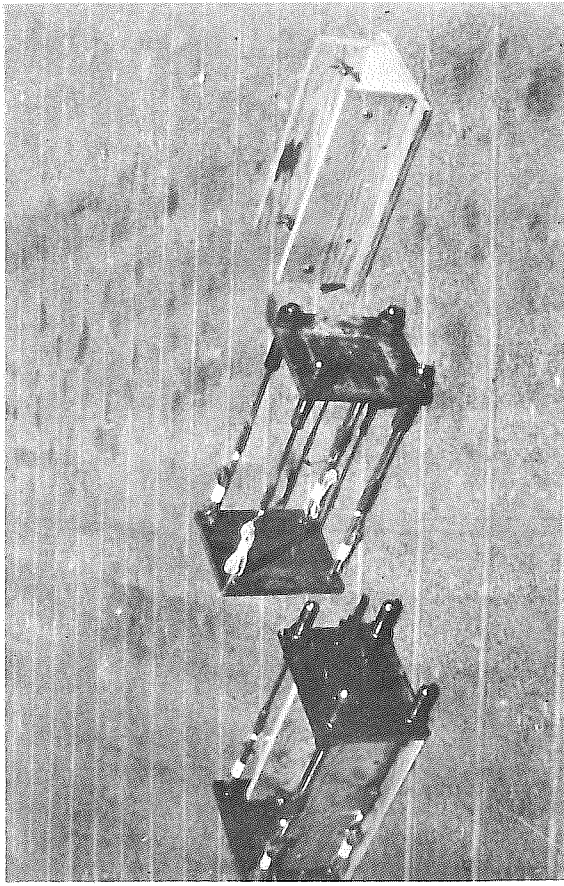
TYPICAL CONNECTION OF A BEAM TO COLUMN
